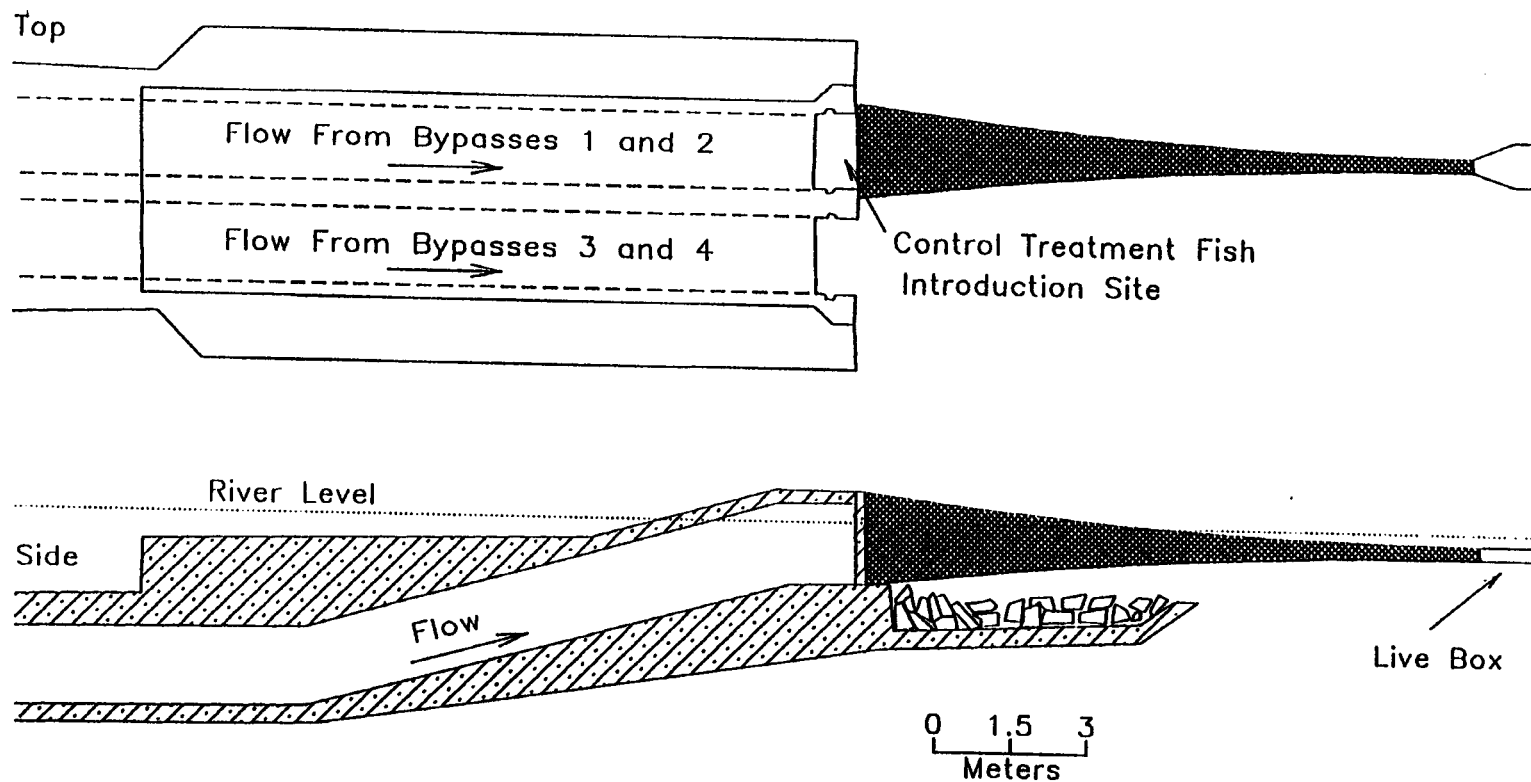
Top and side view of outfall structure including both openings, control fish introduction site, 12.2-m fyke net, and live box. Fyke net was interchangeable between outfall structure openings.
